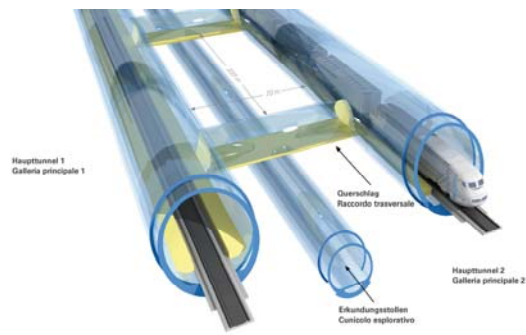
Cross Section Brenner Base Tunnel (BBT15)
